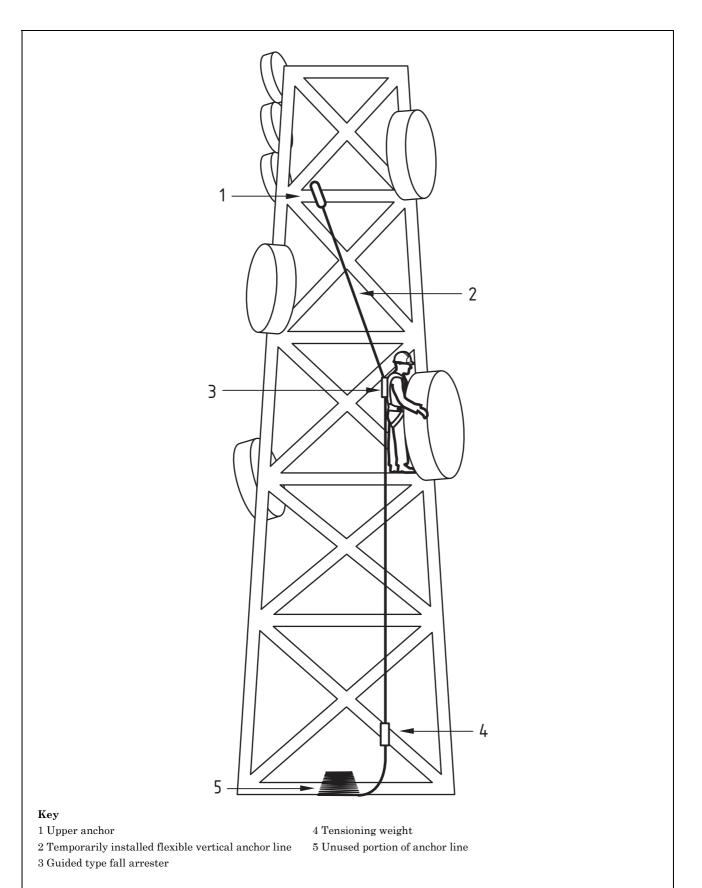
Example of a fall arrest system based on a temporarily installed flexible vertical anchor line
